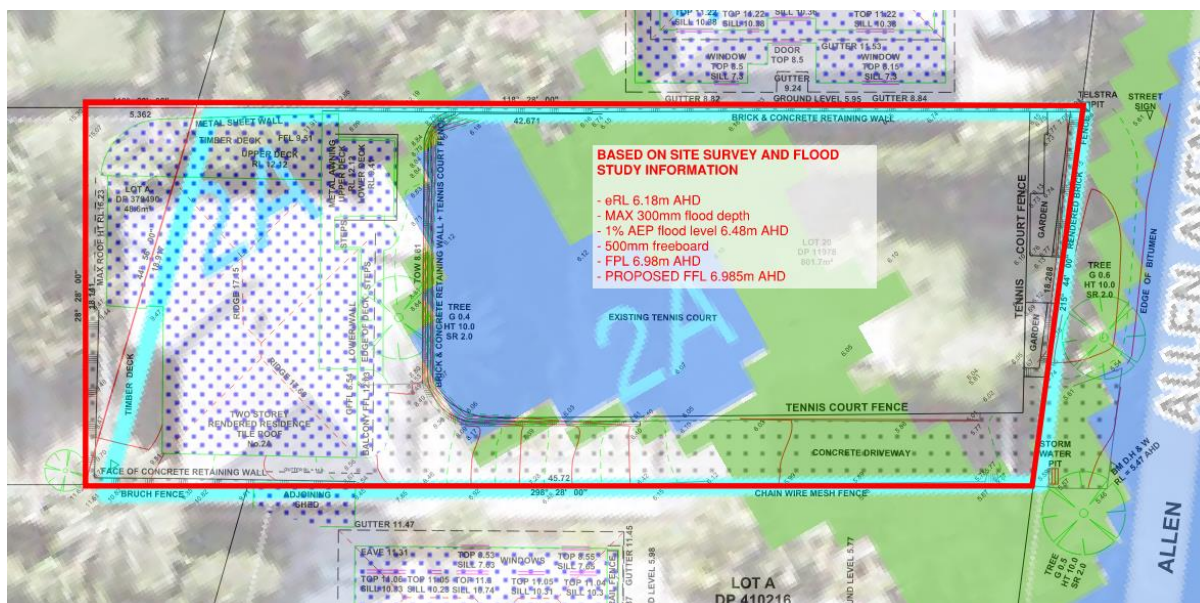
1% AEP Flood Level Overlayed with Site Survey
